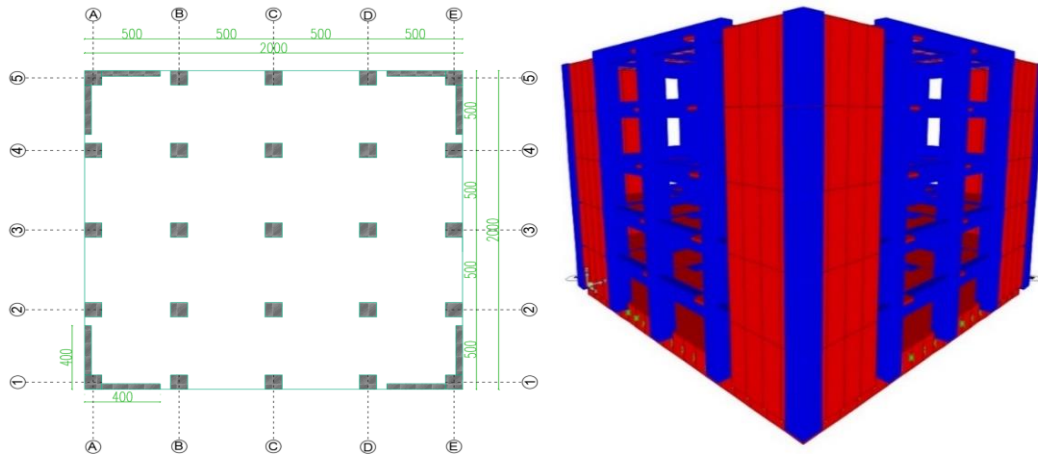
2-dimensional and 3-dimensional sap2000 program visualization of 5-storey shear wall frame system building.
